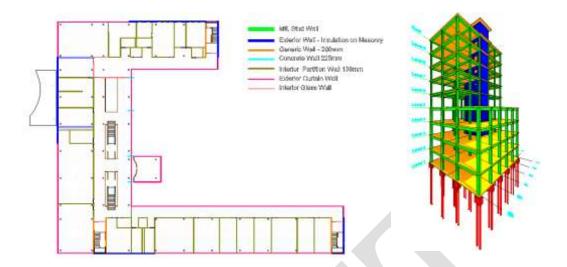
Colour Coding based on Wall Type and Structural Elements – Core Information
